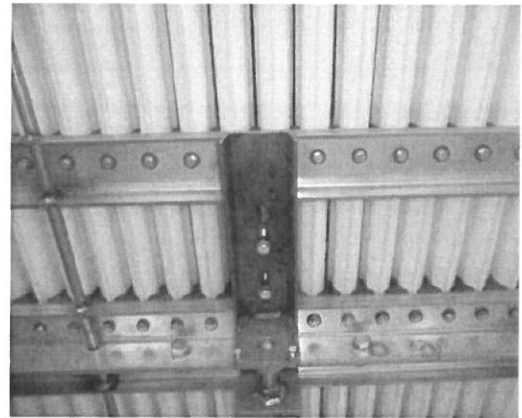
Threaded bolt and thrust washer lowered and lined up with upper jack
